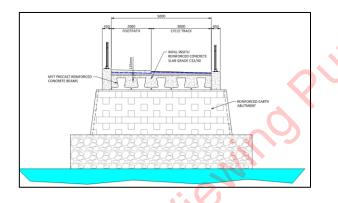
Proposed Pedestrian / Cycle Bridge (Elevation)
